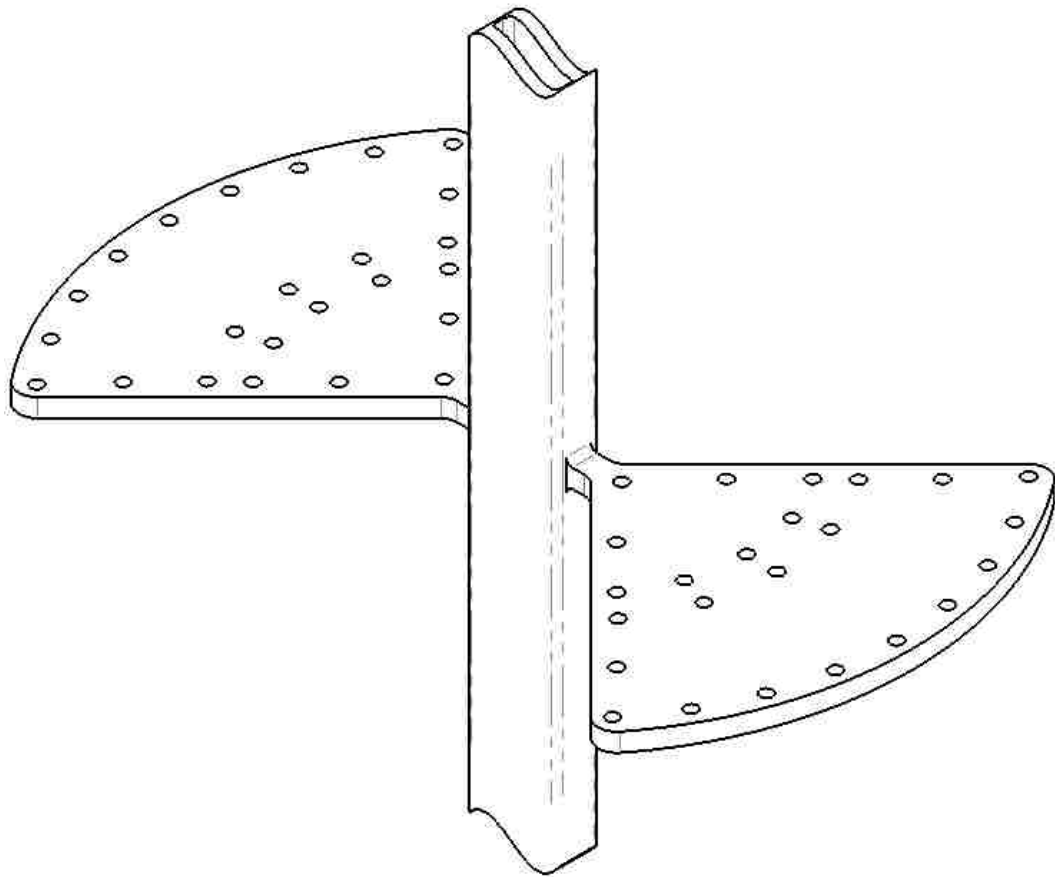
Isometric View. Bi-Cantilevered Drain/Cantilever composed of a Rectangular Drain and two Quarter-circular-shaped Cantilevers attached to the Width.
